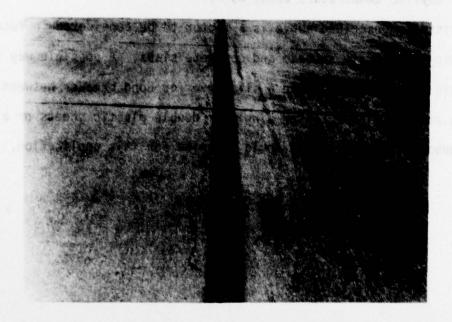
Cracking Distress Along a Centerline Joint in Concrete Overlay, Shreveport.
